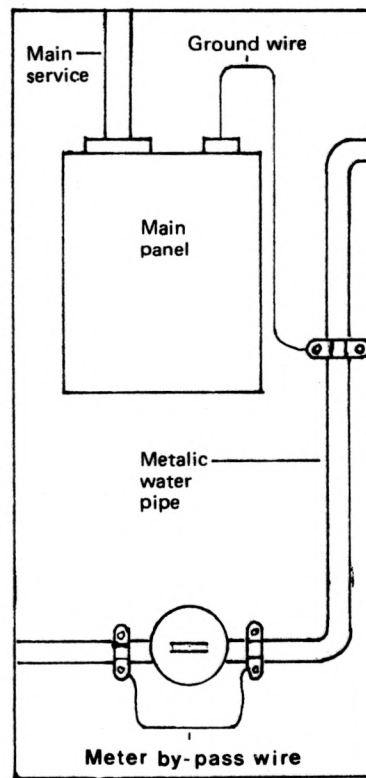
GROUNDING BY CONNECTING TO INCOMING METALLIC WATER PIPE
